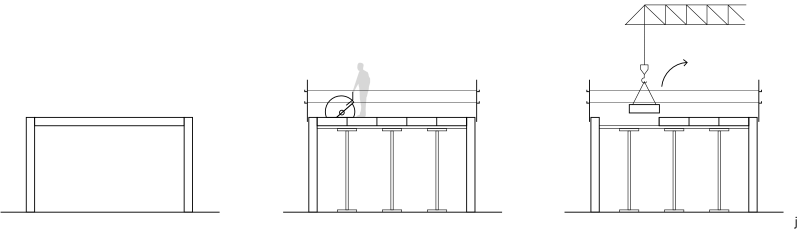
Methods of deconstruction of a concrete slab by sawing, (building in Lancy GE by Belastock in 2018).
